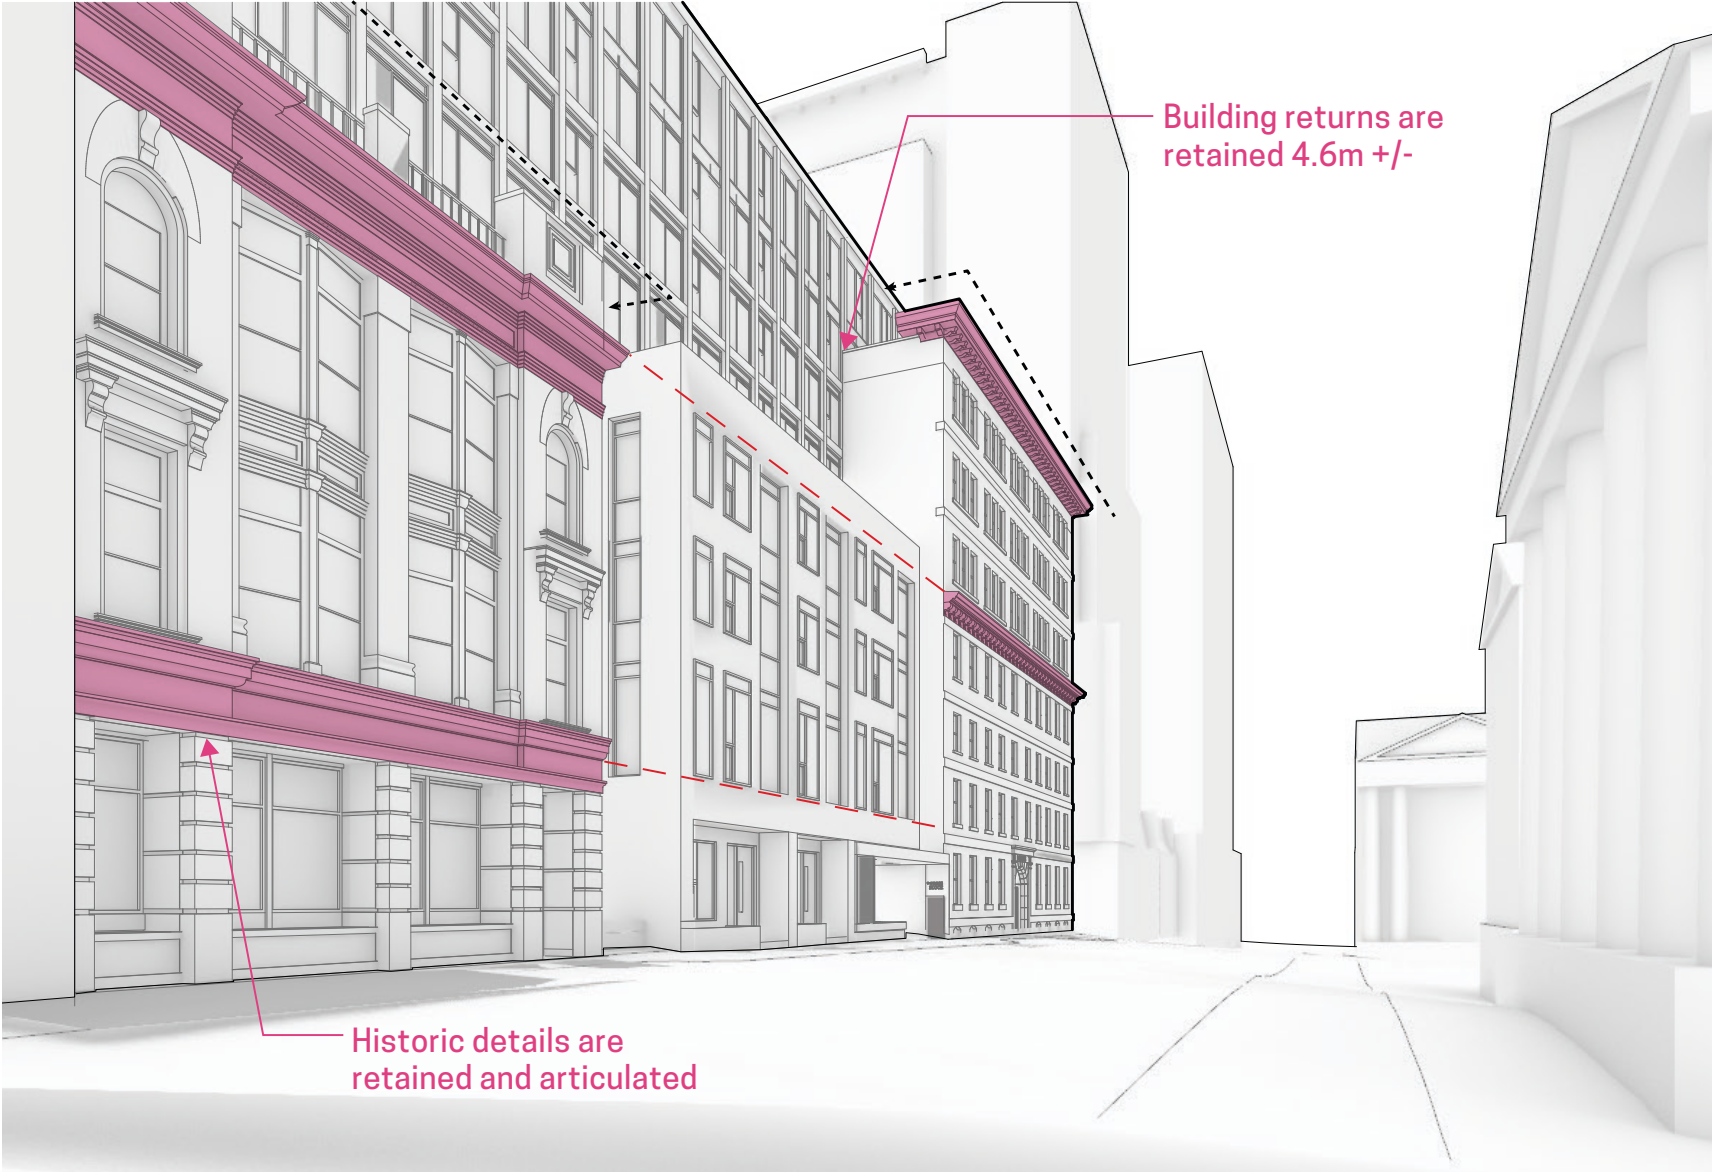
b Streetwall Width: Reveals at streetwall and retention of building returns allow for articulation of historic details.
